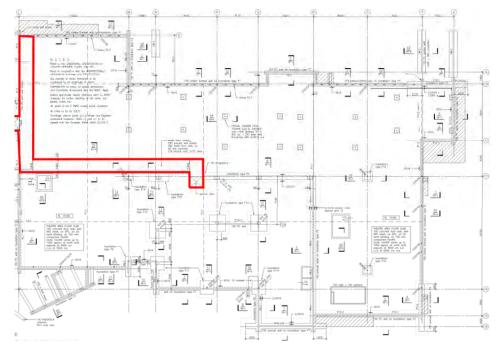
SOU Theatre area ground floor plan (red lines indicate extent of service tunnel)
